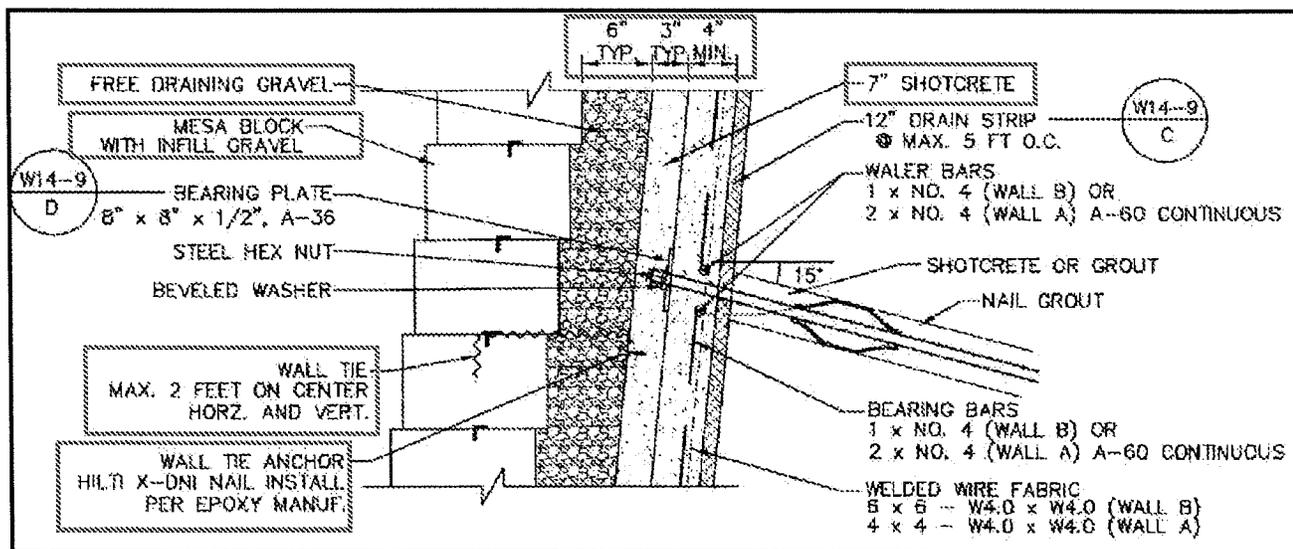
Excerpt from sheet W14-9 from Ground Engineering design drawings showing soil nail wall cross section; notated with red rectangles to highlight areas discussed above
